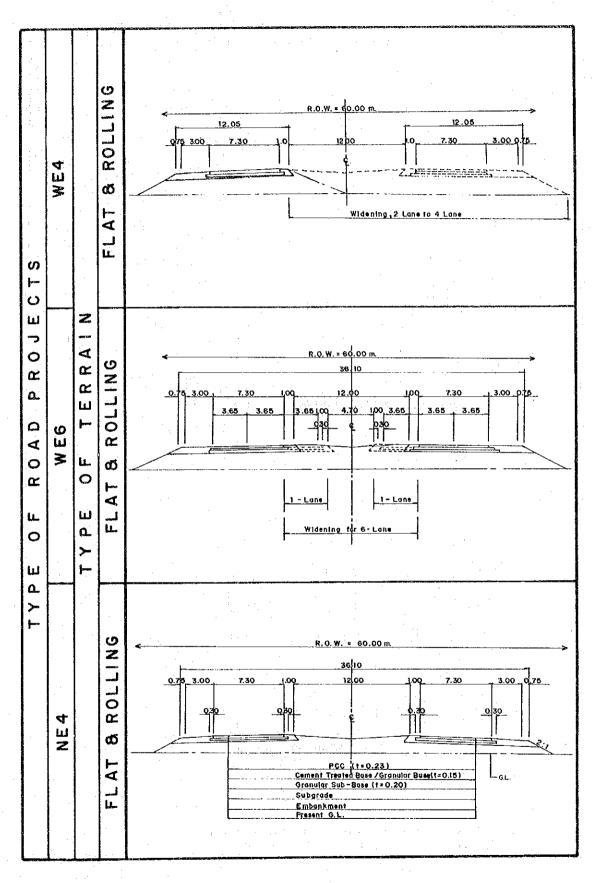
TYPICAL EXPRESSWAY CROSS-SECTION
